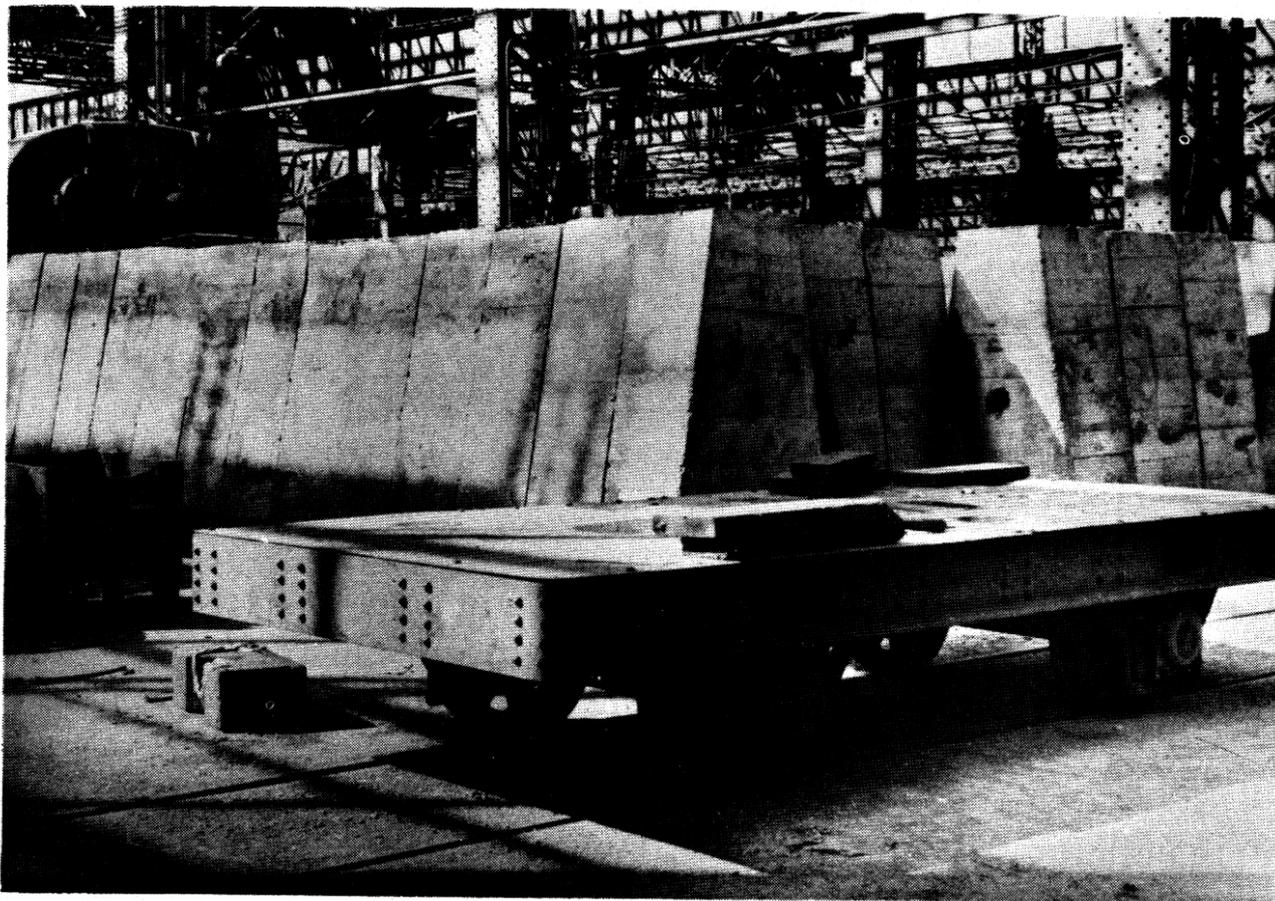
Precast, reinforced-concrete blast walls (0.85 mile from ground zero at Nagasaki).
